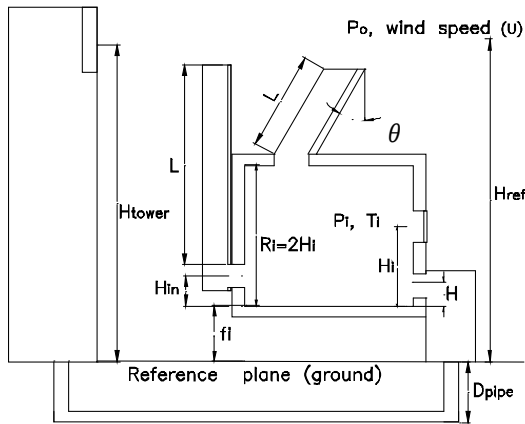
A zone connected to roof mounted solar chimney; wall mounted solar chimney and wind driven earth air tunnel
